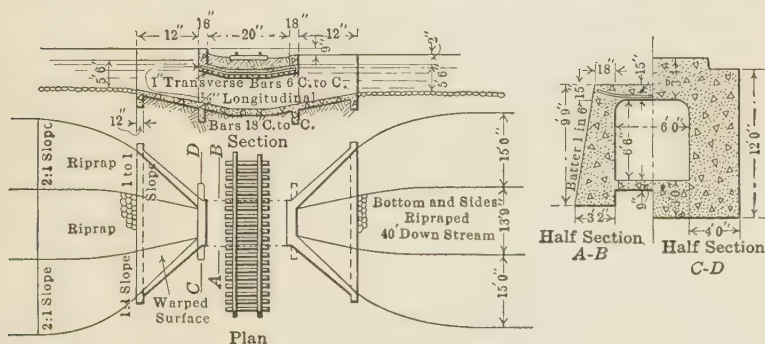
Railroad crossing. Umatilla Project, Ore.
